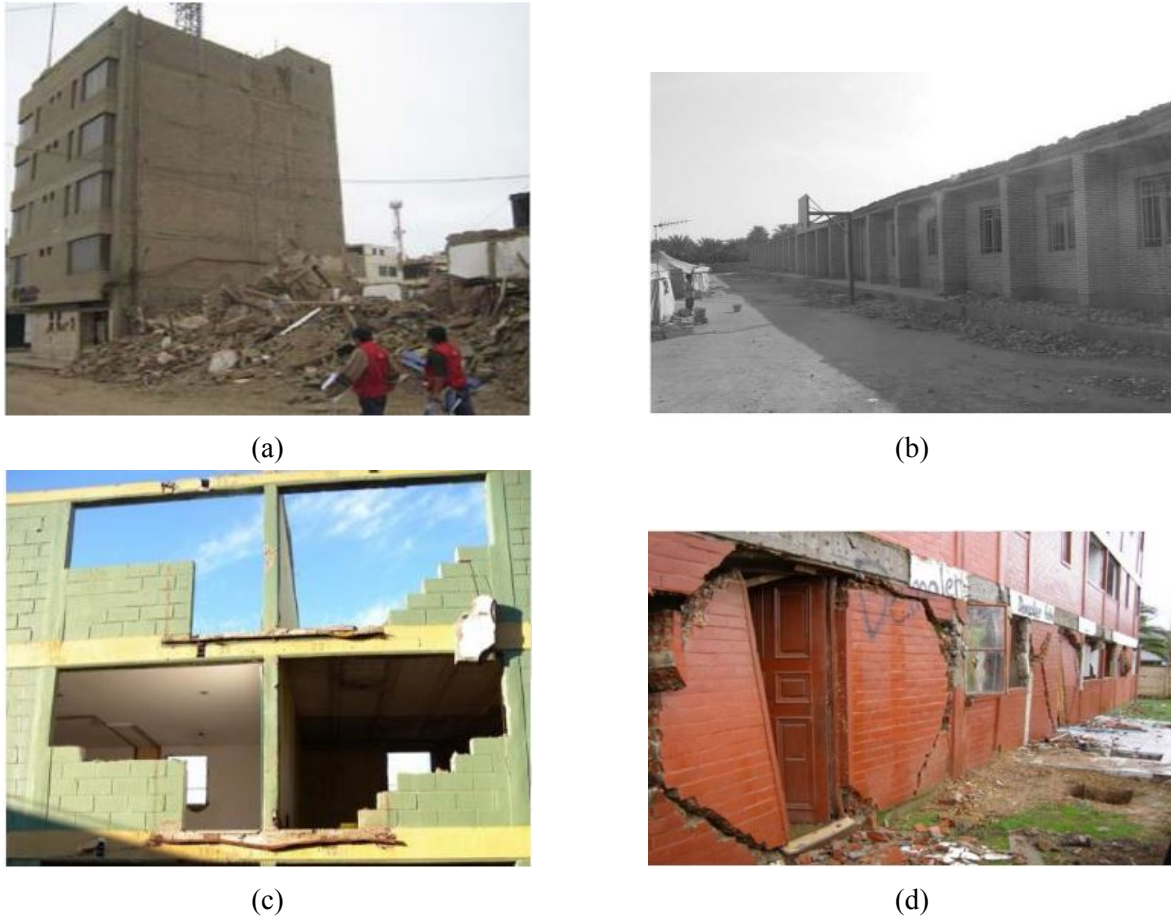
Performance of CBM structures during past earthquakes: (a) six storey CBM building remained undamaged in 2007 M8.0 Pisco, Peru earthquake while the adjacent adobe building collapsed [5], (b) undamaged CBM school survived after 2003 M6.5 Bam, Iran earthquake whereas nearby structures totally collapsed [8], (c) Absence of RC tie-column resulted in damage to CBM building in the 2010 Chile earthquake [9] and, (d) damage to ground floor of a medium rise CBM apartment in 2010 Maule, Chile, earthquake [9]
